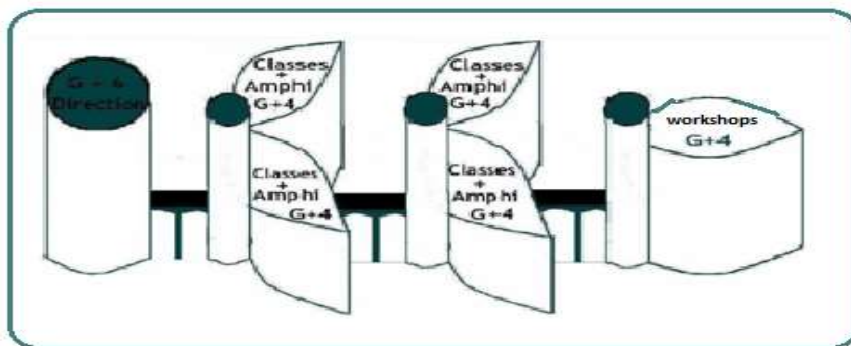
Architectural model on architecture and Town planning faculty (Source ;Author 2024)
